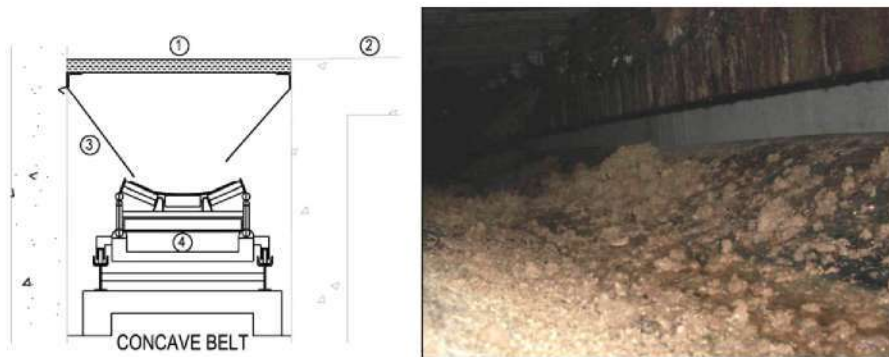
Transversal section of concave belt (1, slatted floor; 2, concrete floor; 3, deflector; 4, belt) and droppings clusters on the belt.
